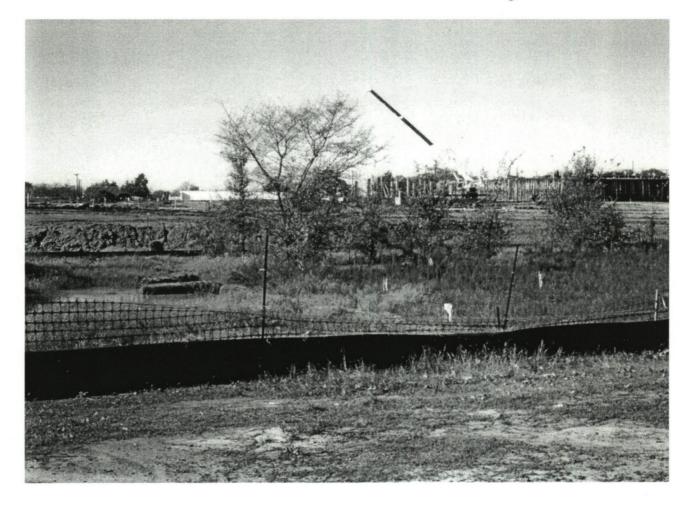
View from athletic area toward academic buildings - bridge will be to right of hay bales, between posts with colored ribbons
